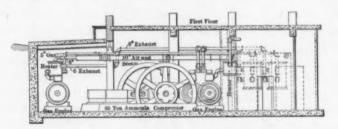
ELEVATION OF MACHINERY ROOM IN CROSS-SECTION
